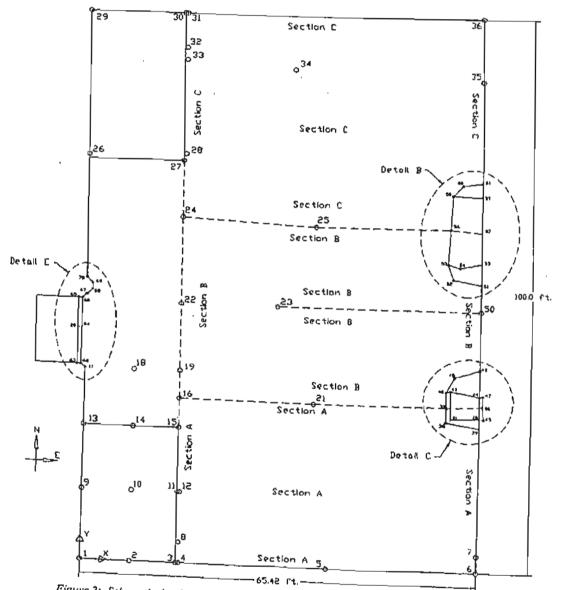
Schematic the shows CSA II, known elevation points, and ramp details
